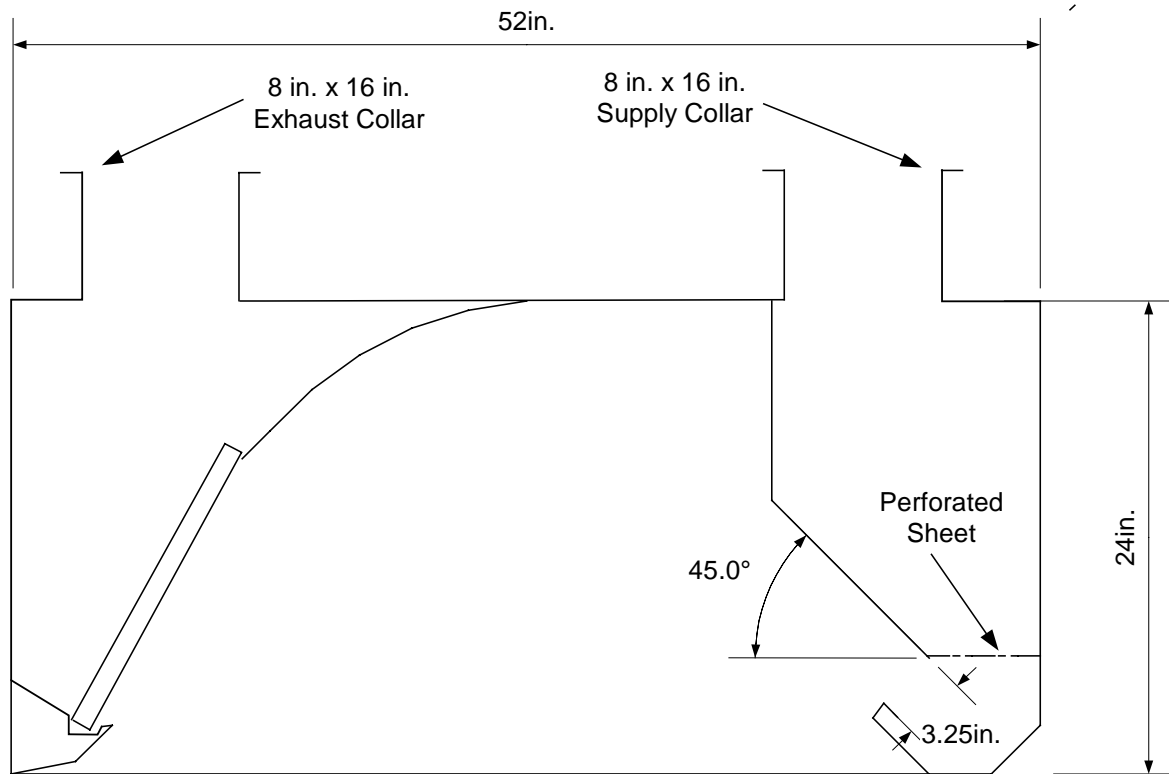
Cross-Section Drawing of Wall Mounted Short Circuit Canopy Hood.
